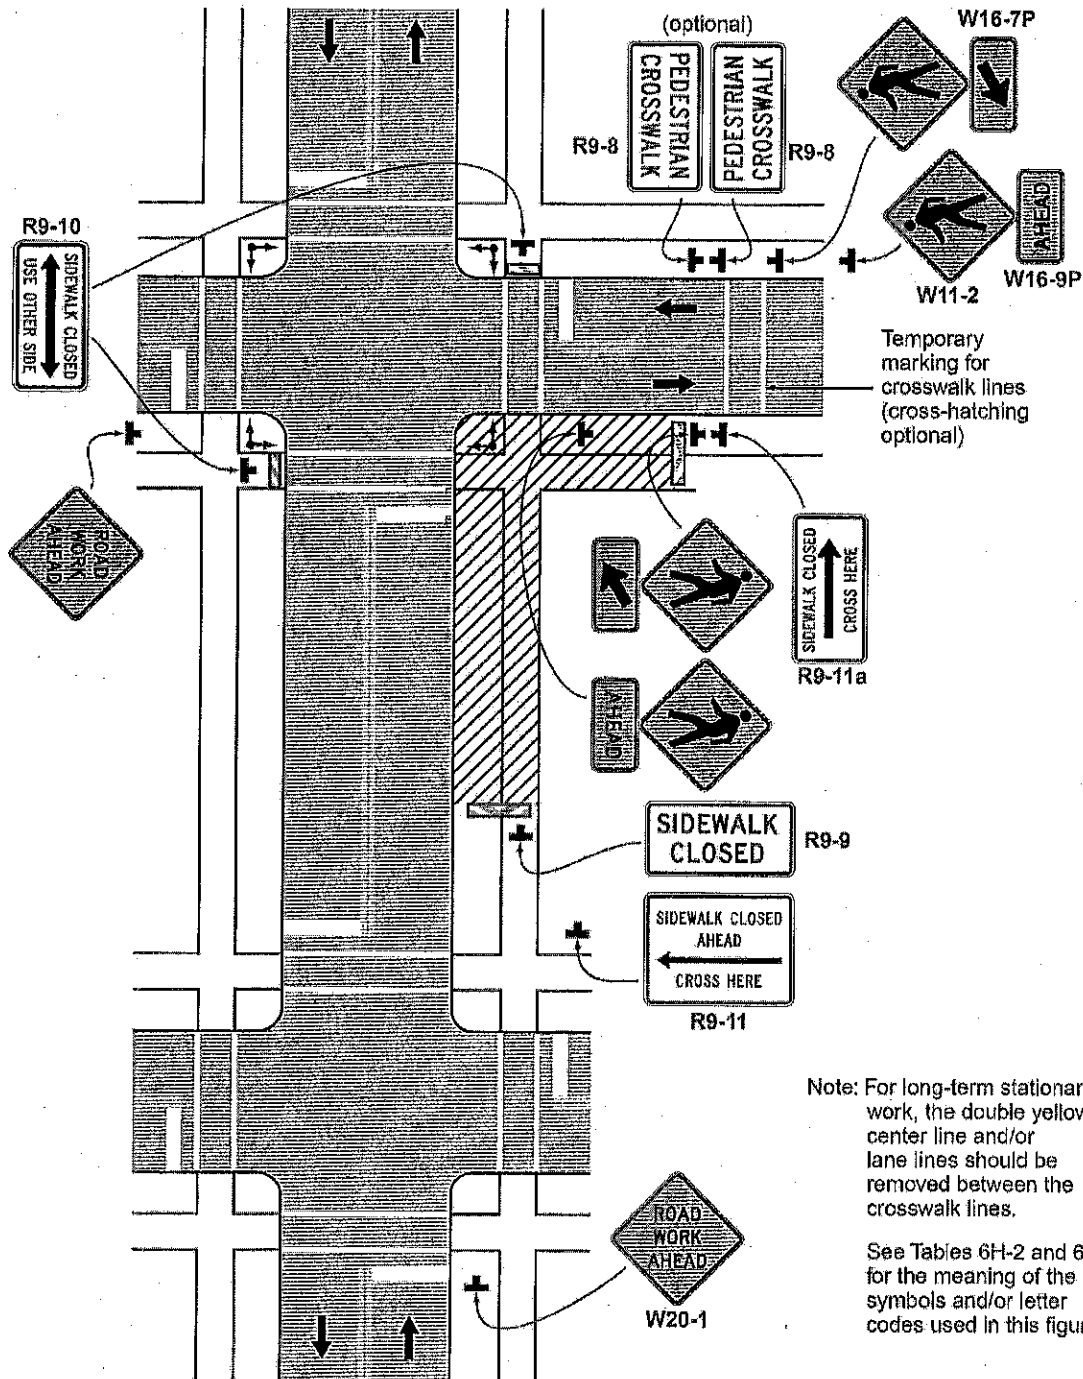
H-28. Sidewalk Detour or Diversion (TA-28)
